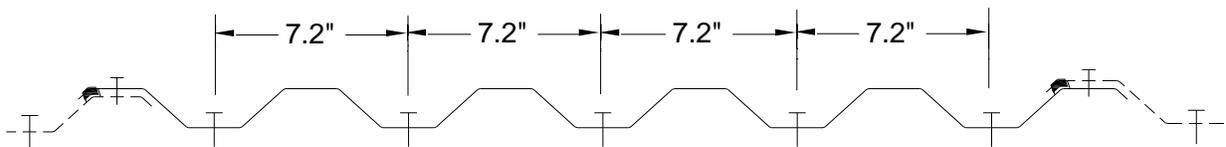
Hefti-Rib Metal Panel – Fastener Pattern
